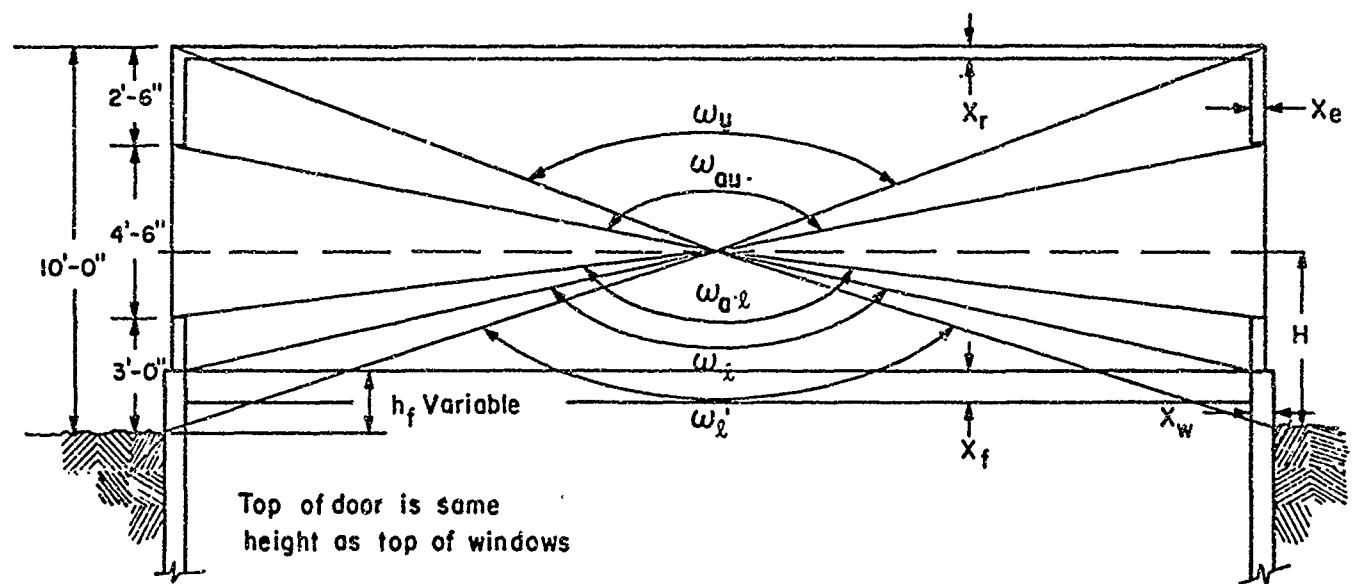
Elevation of schematized KSU test house with solid angle fractions for a first-story detector location.
